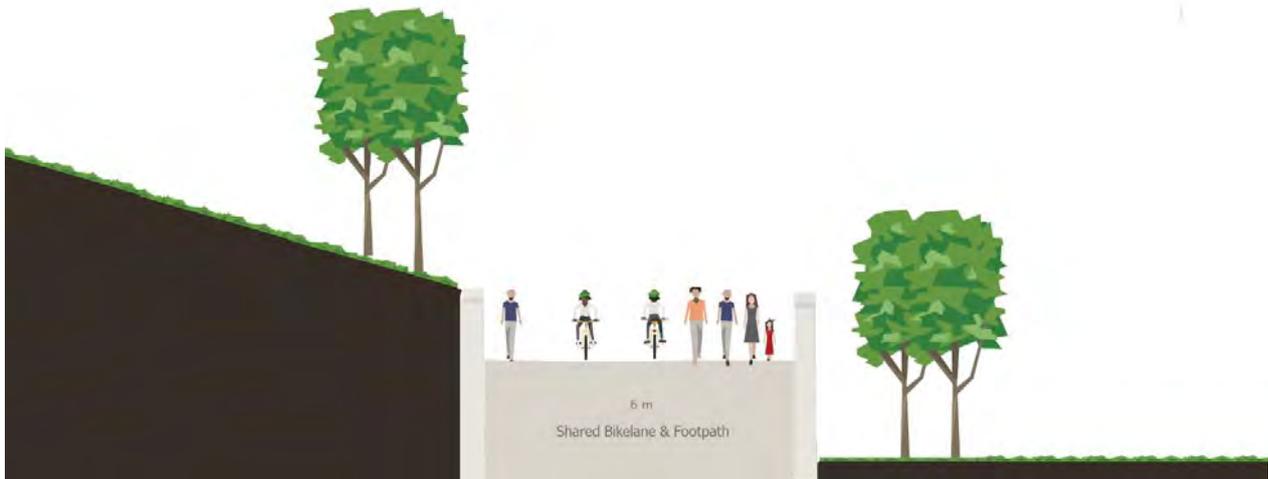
Route 2A, Cross Section B-B Proposed
